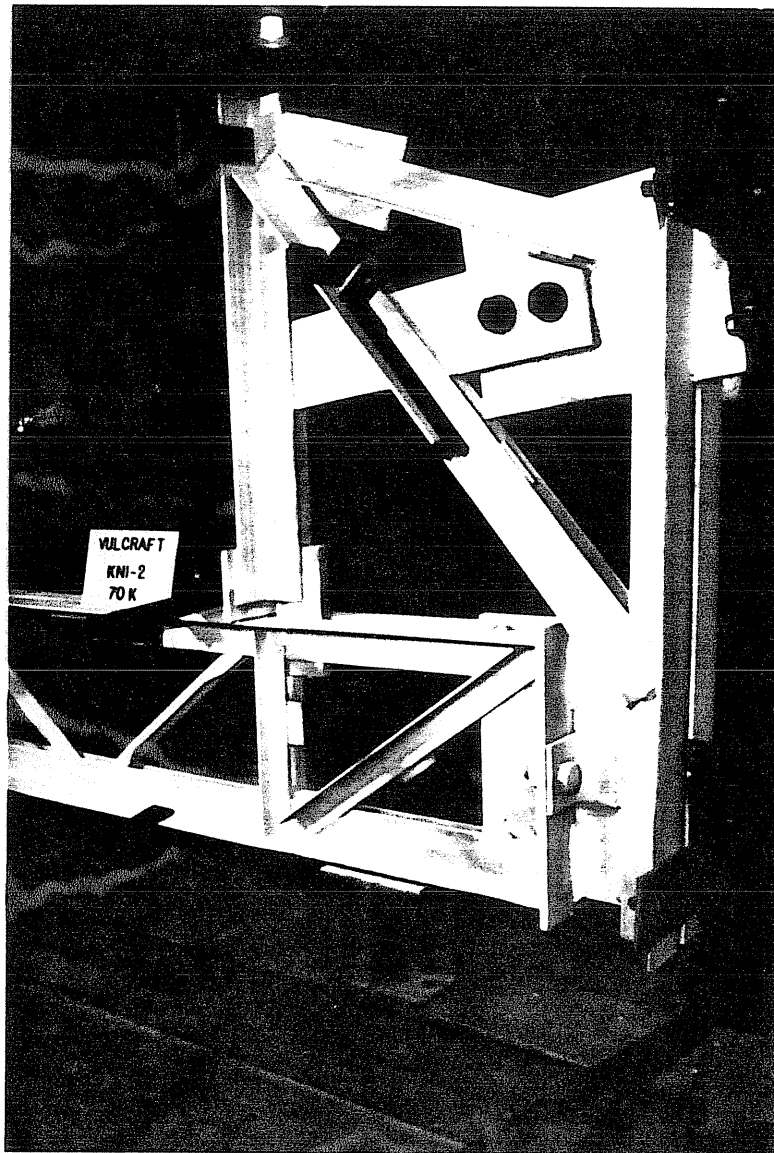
PHOTOGRAPH OF SPECIMEN KN-1-2 UNDER MAXIMUM LOAD
